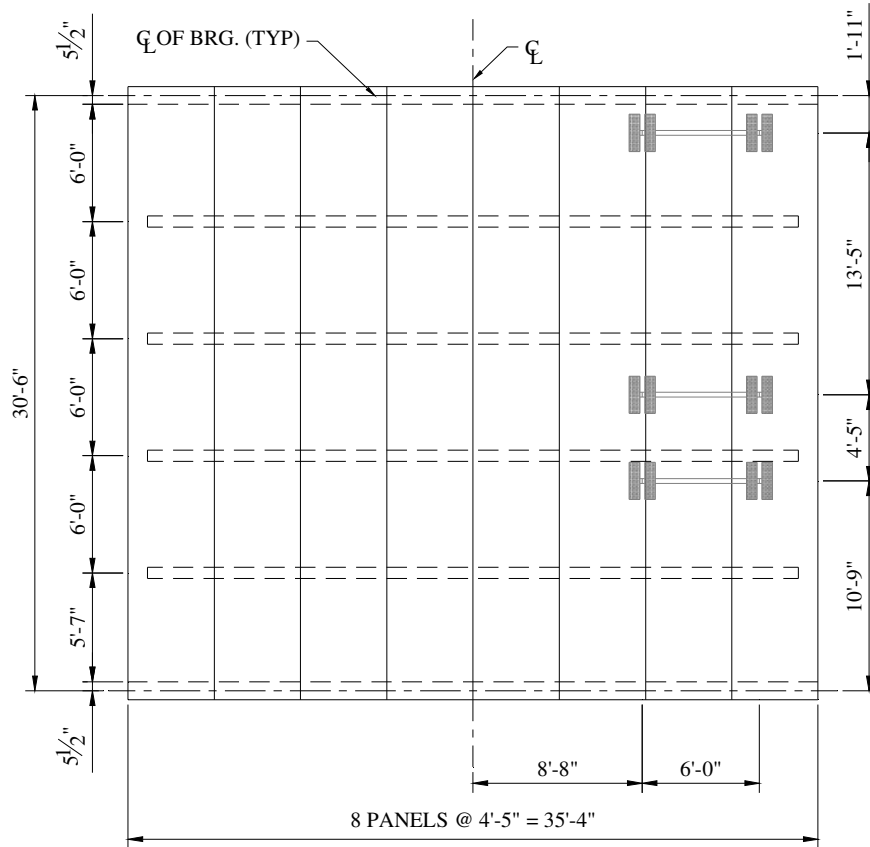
Controlling Load Position for East Main Street Bridge, Plan View
